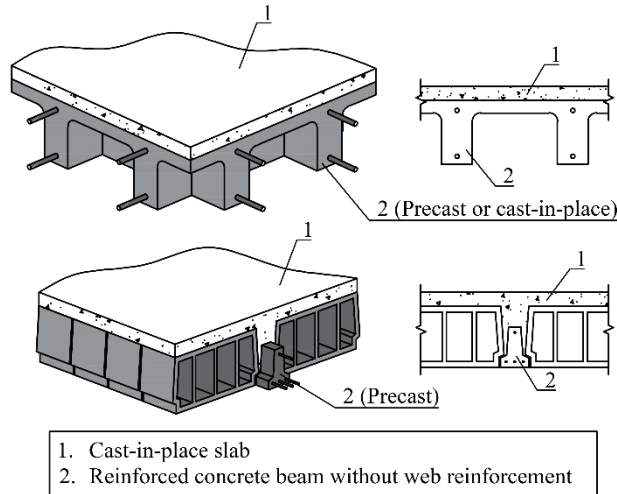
Examples of structural elements compound of a reinforced concrete beam without web reinforcement and a cast-in-place slab.
